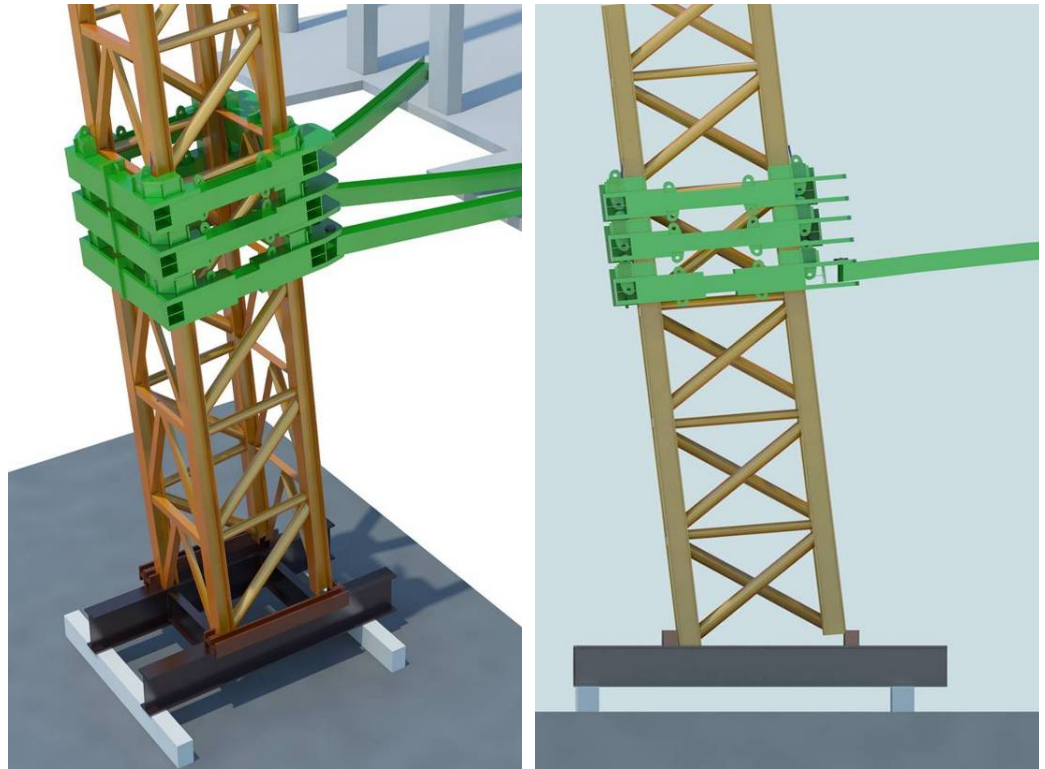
Elevation of the tower at the 3rd floor showing dunnage slippage at the supporting concrete walls and the uplift at the back legs of the tower (initiation of the tower rotation). Prepared by Arup.
